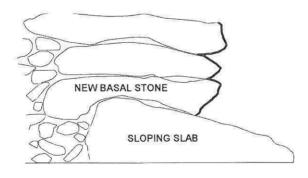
Collapse Y10, method used to secure the base of the wall.
